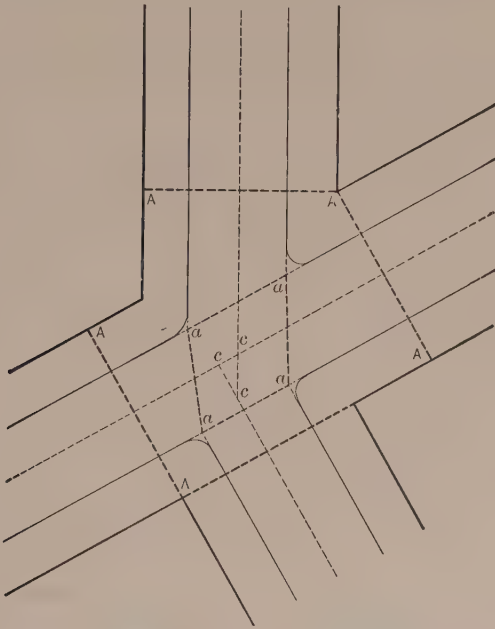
Sketch Showing Curb Line and Building Line Platforms.
